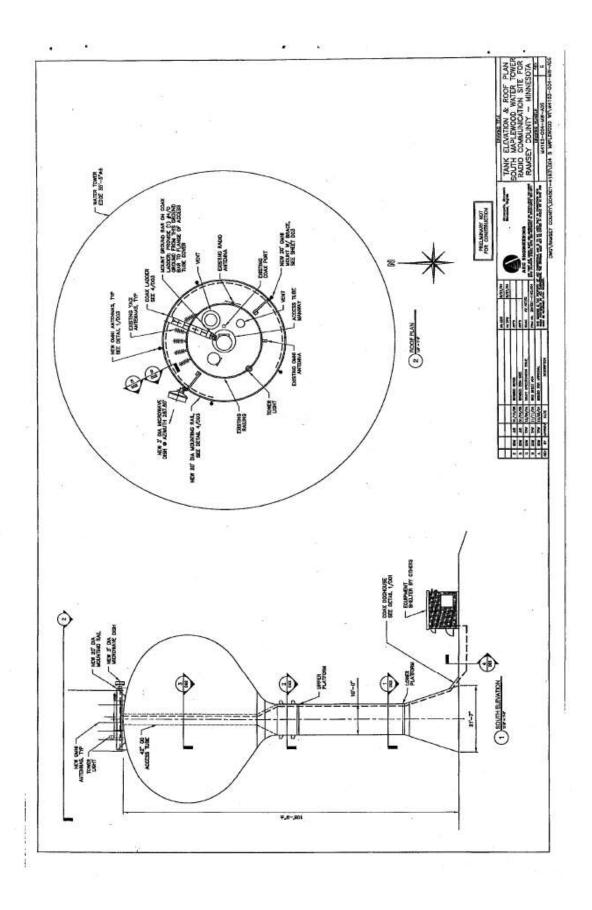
## EXHIBIT "C" Sterling Street Water Tower <u>Antenna Facilities</u>
